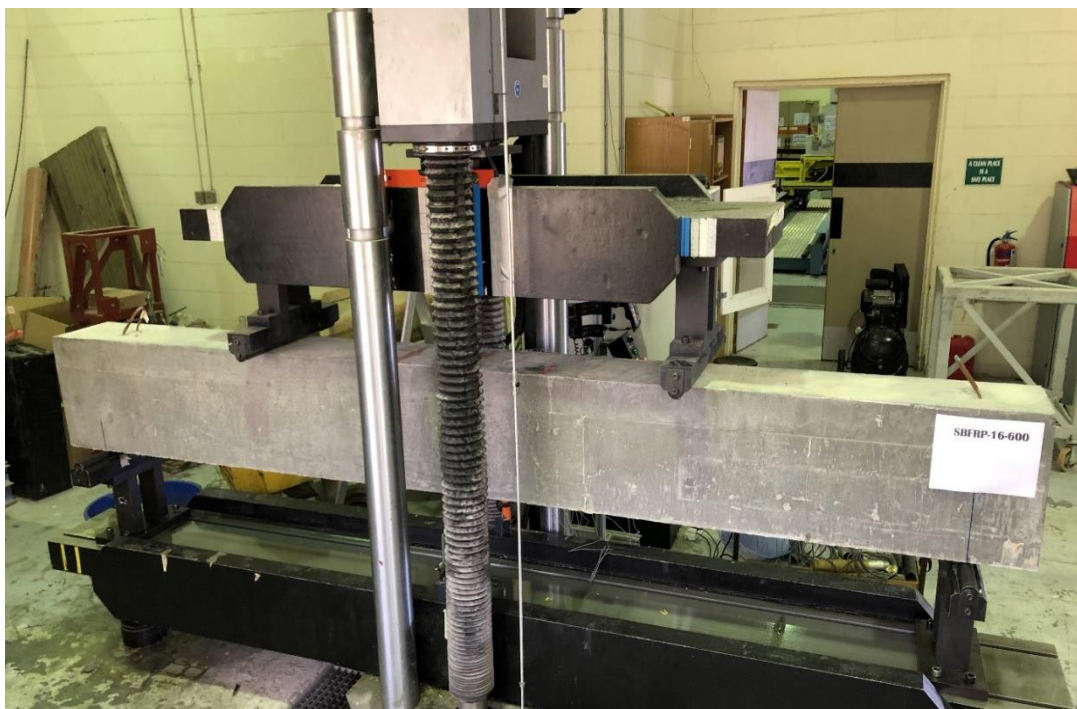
Beam 7 (SBFRP-16-600) testing setup
